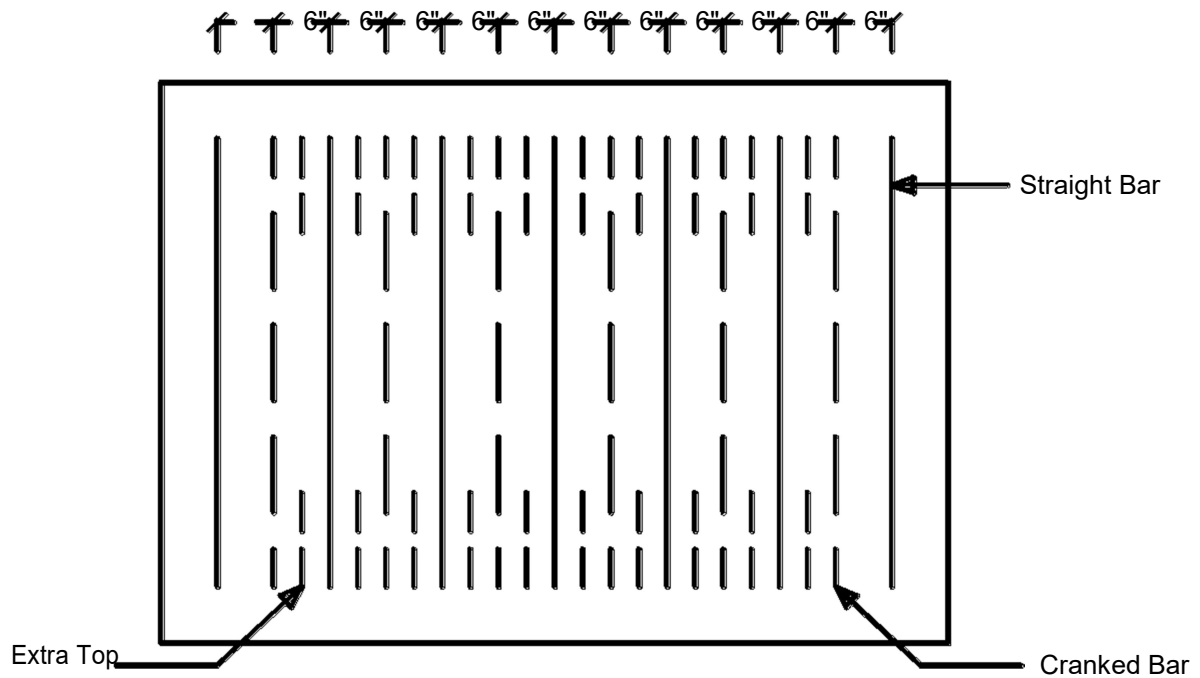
Demonstration of Slab Reinforcement Pattern.
